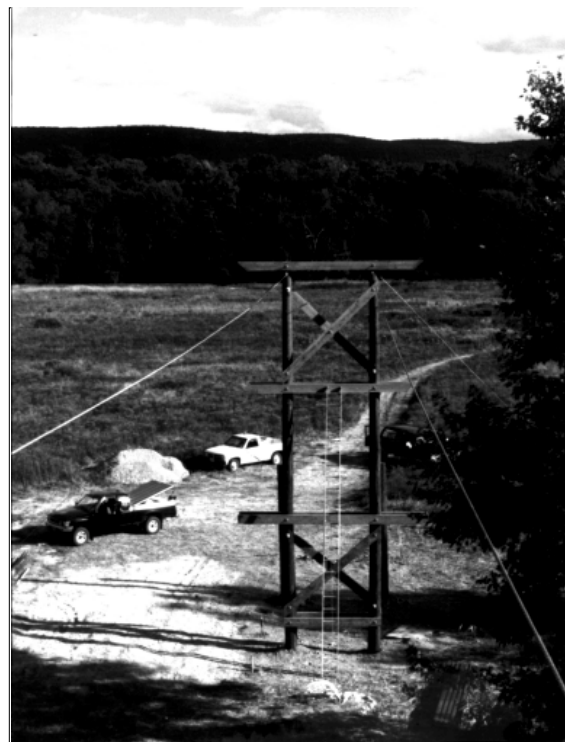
View from the east tower looking at the west tower and Wawayanda Mountain during construction. Shows the structural strand guylines running between the towers. *Photo Courtesy of Mr. Tibor Latincics.
